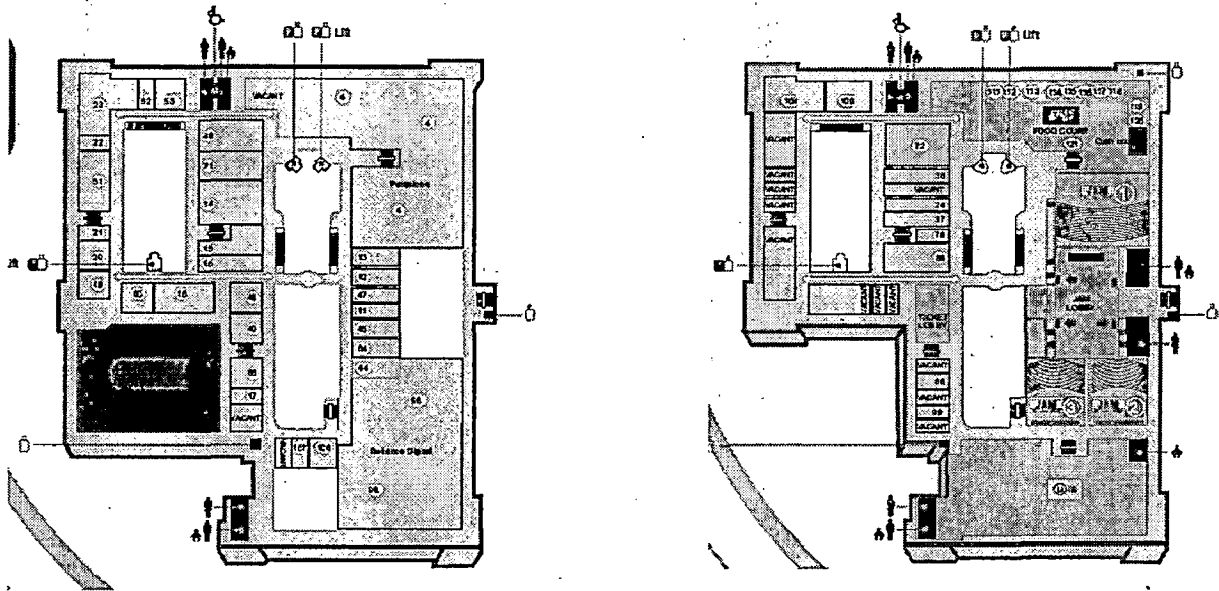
FLOOR PLANS OF SHIPRA MALL
